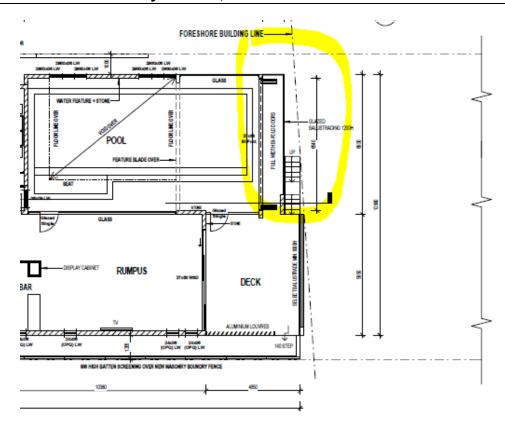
Approved ground floor plan (approved deck structure highlighted yellow)
